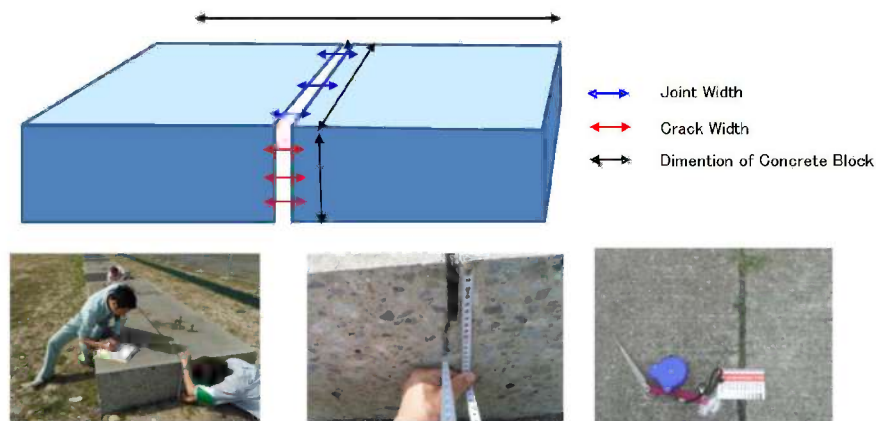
Gap terminology (Up) for pavement and measurement of joint width on concrete block (Bottom)
